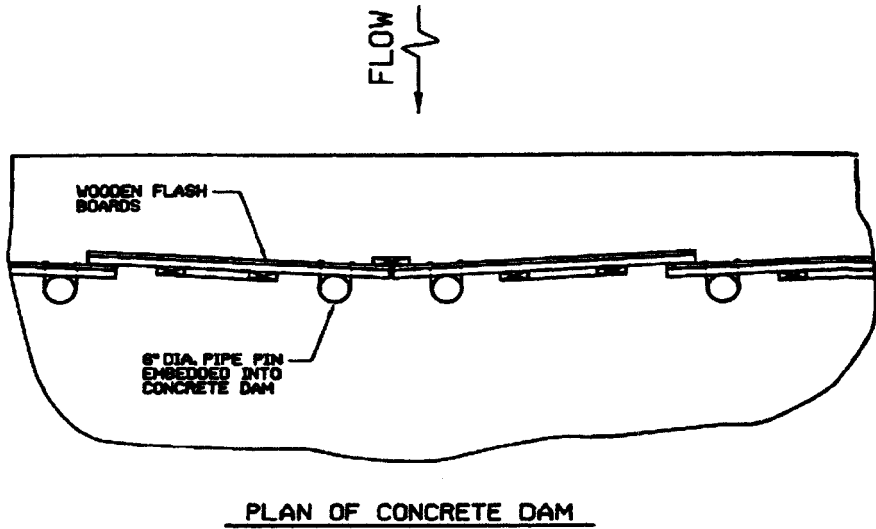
Plan of Spillway Showing the Manual Trippable Board System (courtesy of Brookfield Power New York)
